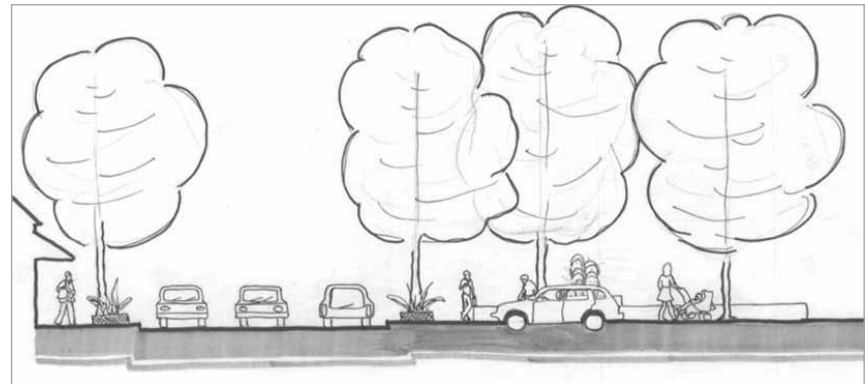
RTE. 135 LOOKING EAST: Street trees, rain gardens, and a pocket park improve the crossroads.
